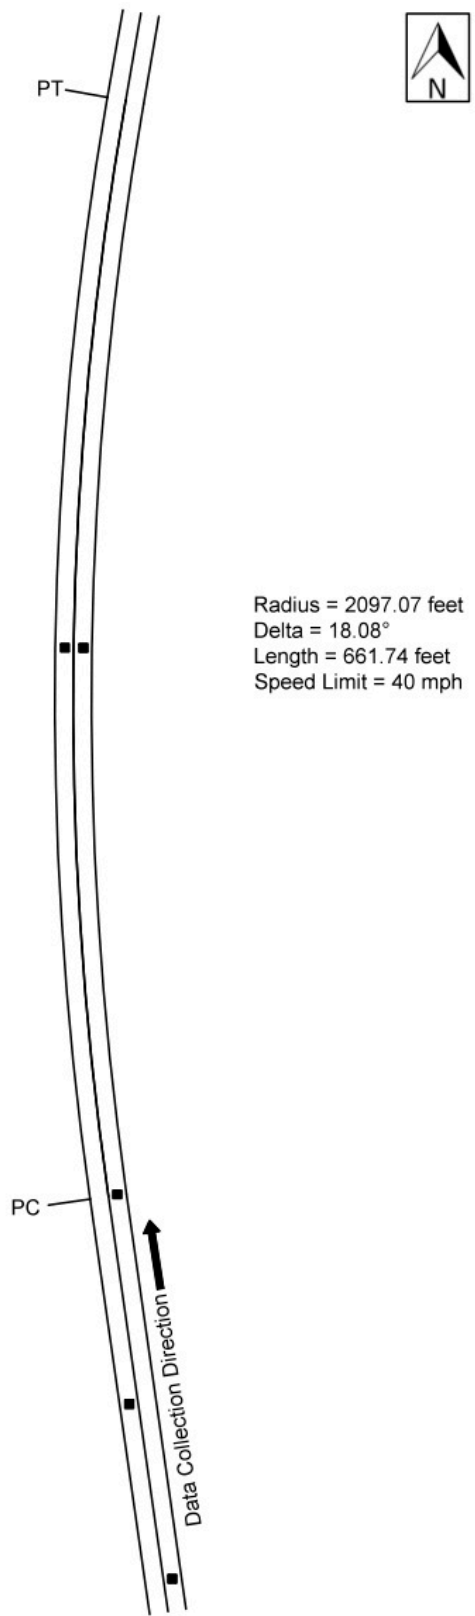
Diagram. Geometric layout of northbound Braley Hill Road (not to scale).
